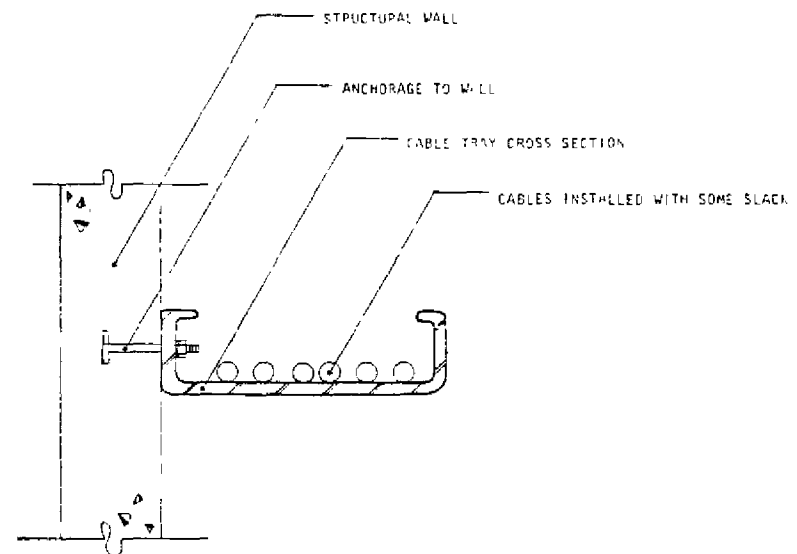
Communication systems. Cable tray anchorage to structural wall.
